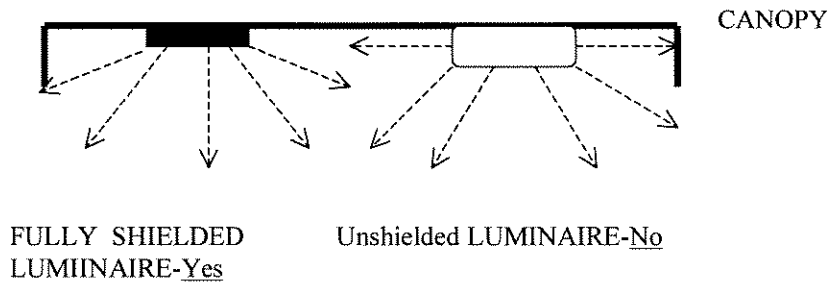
Building canopies, overhangs, roof eaves and similar types of construction shall not be considered as the means for providing the light cutoff. The cutoff characteristics shall be achieved by the LUMINAIRE itself.
